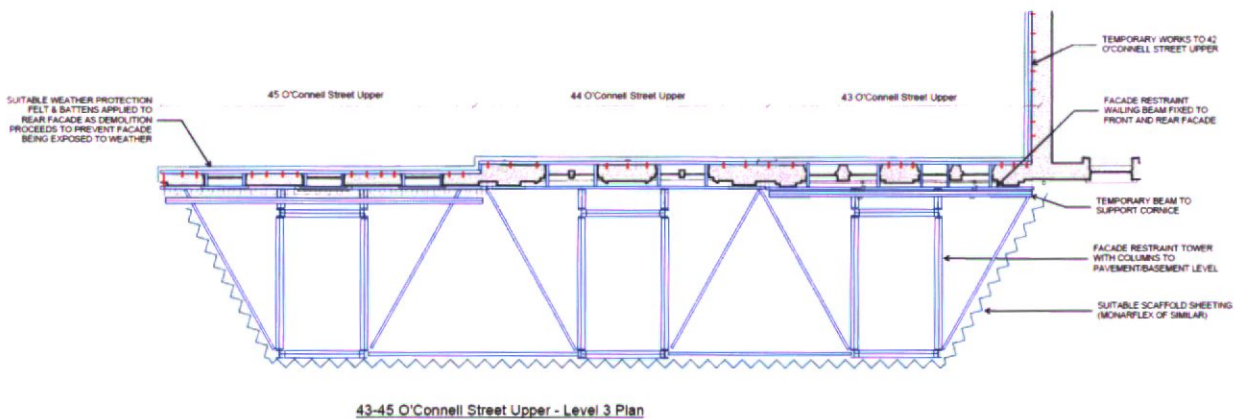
43-45 O’Connell Street Upper (Plan – Typical Façade Restraint System)
